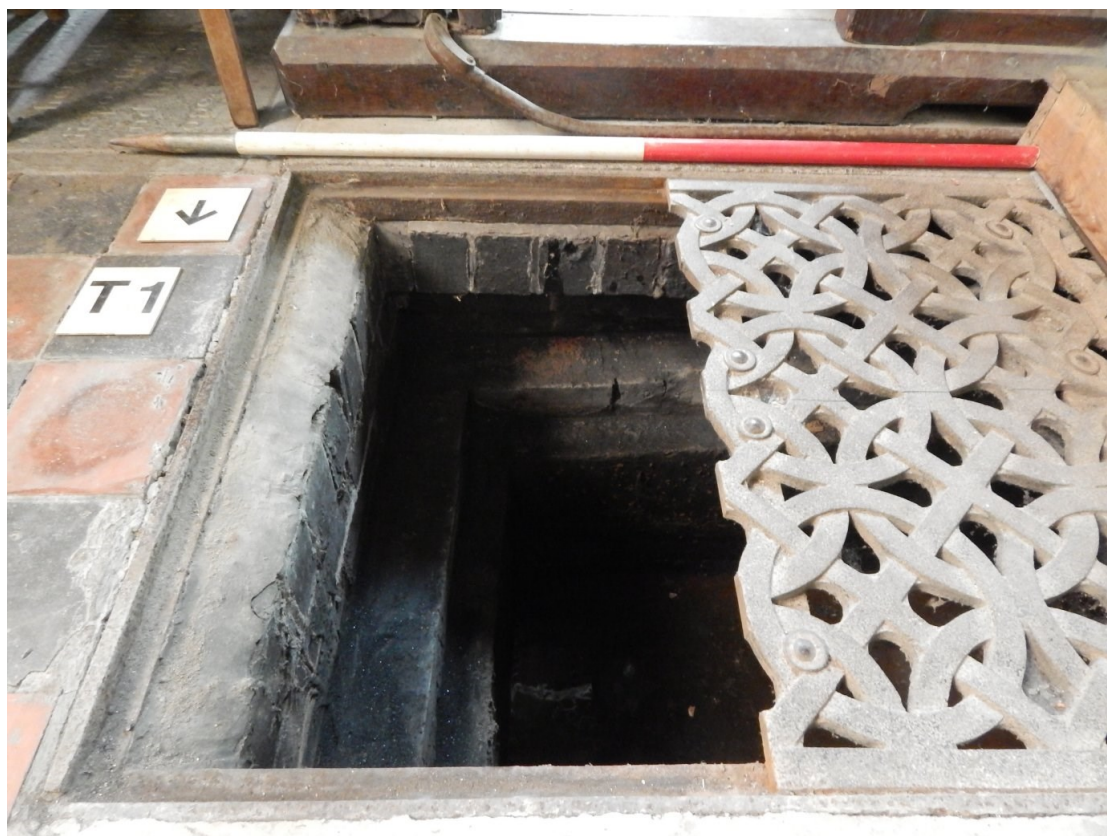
Test Pit 01; western end of heating system, with grille part removed
